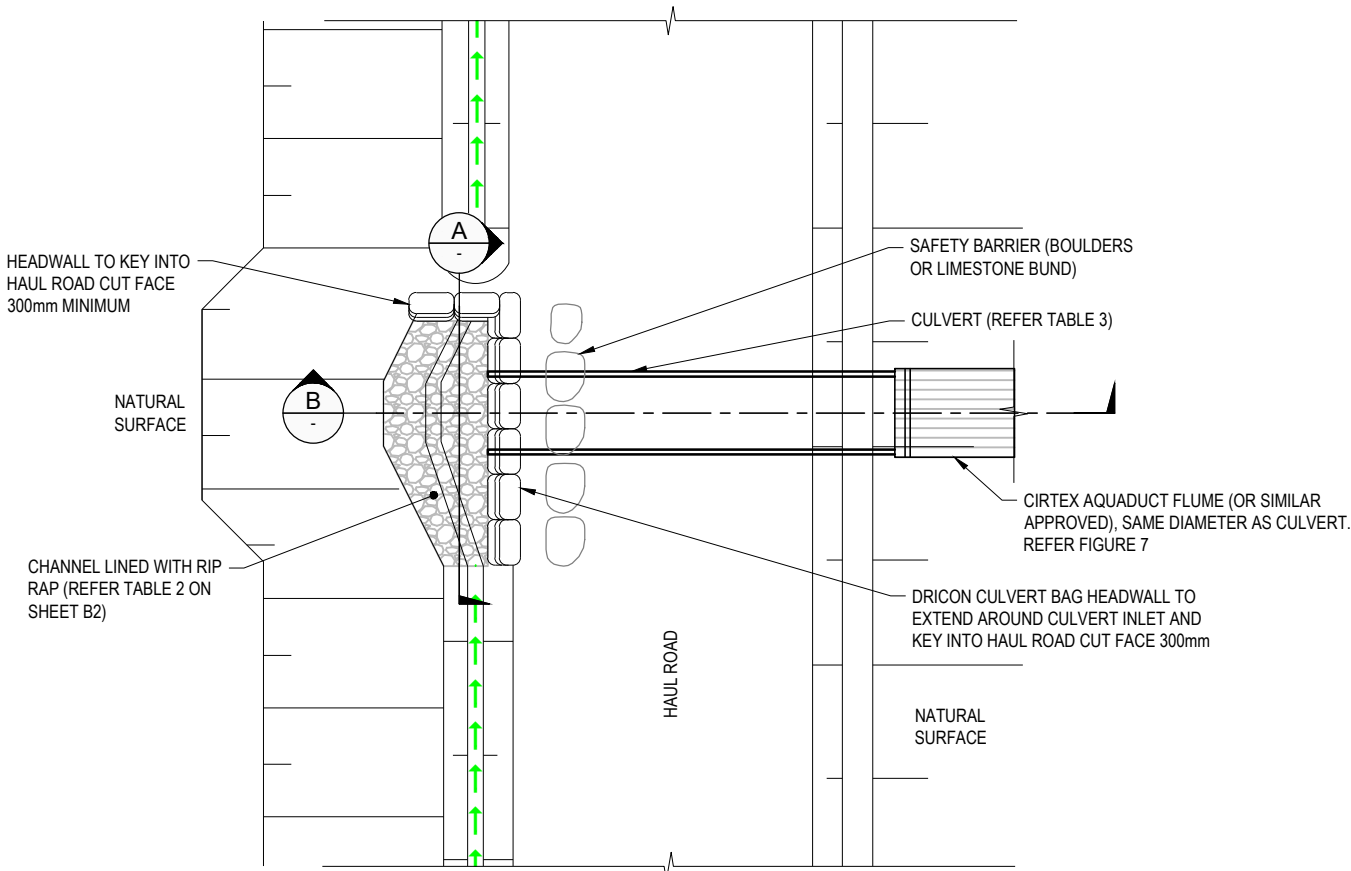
HAUL ROAD CULVERT LAYOUT
